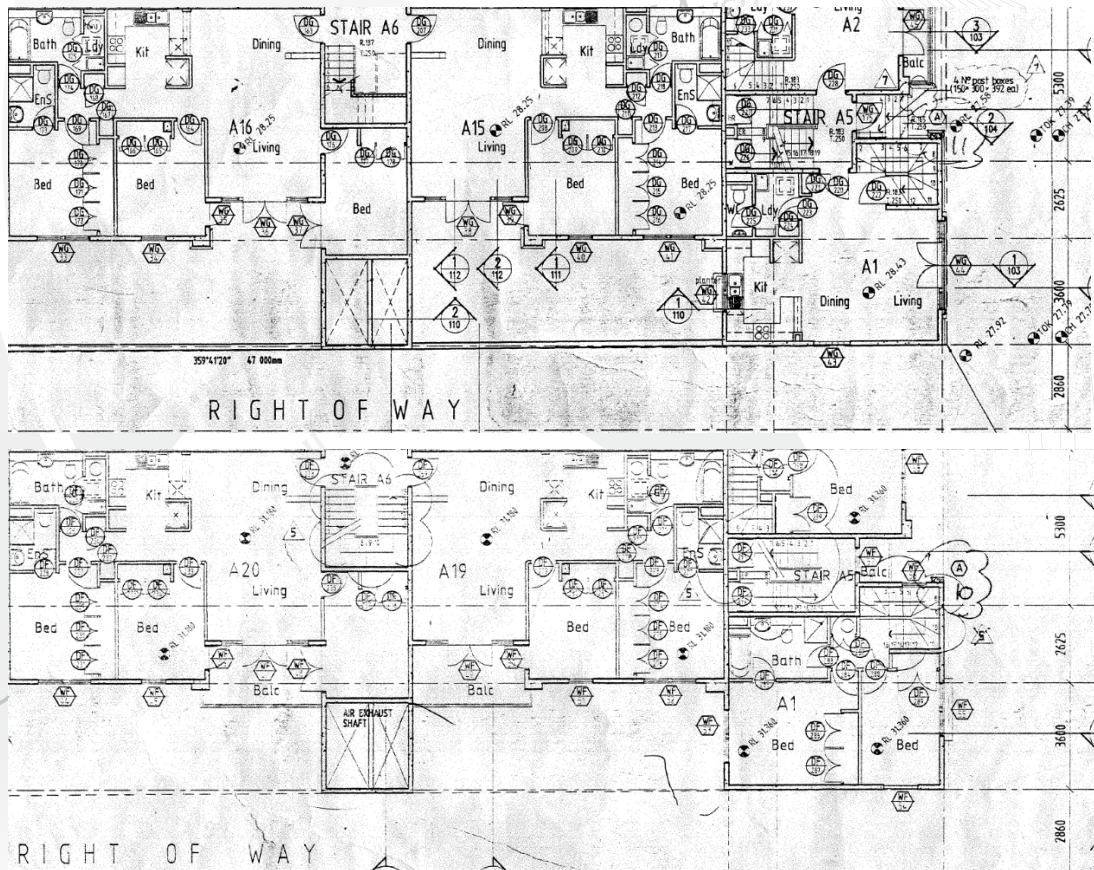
layout of dwellings 15, 16, 19 and 20 of the VATR complex. Albert Street sits to the right of the images.
